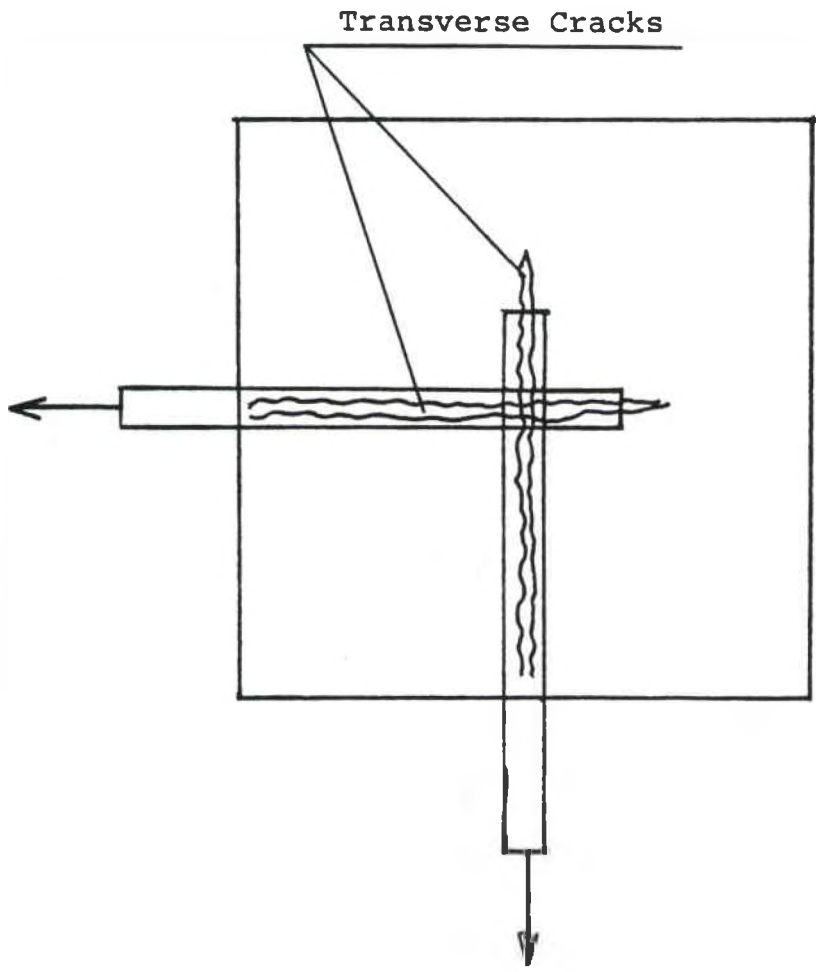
Transverse Cracks in Two-Way Slab. (Top View).
